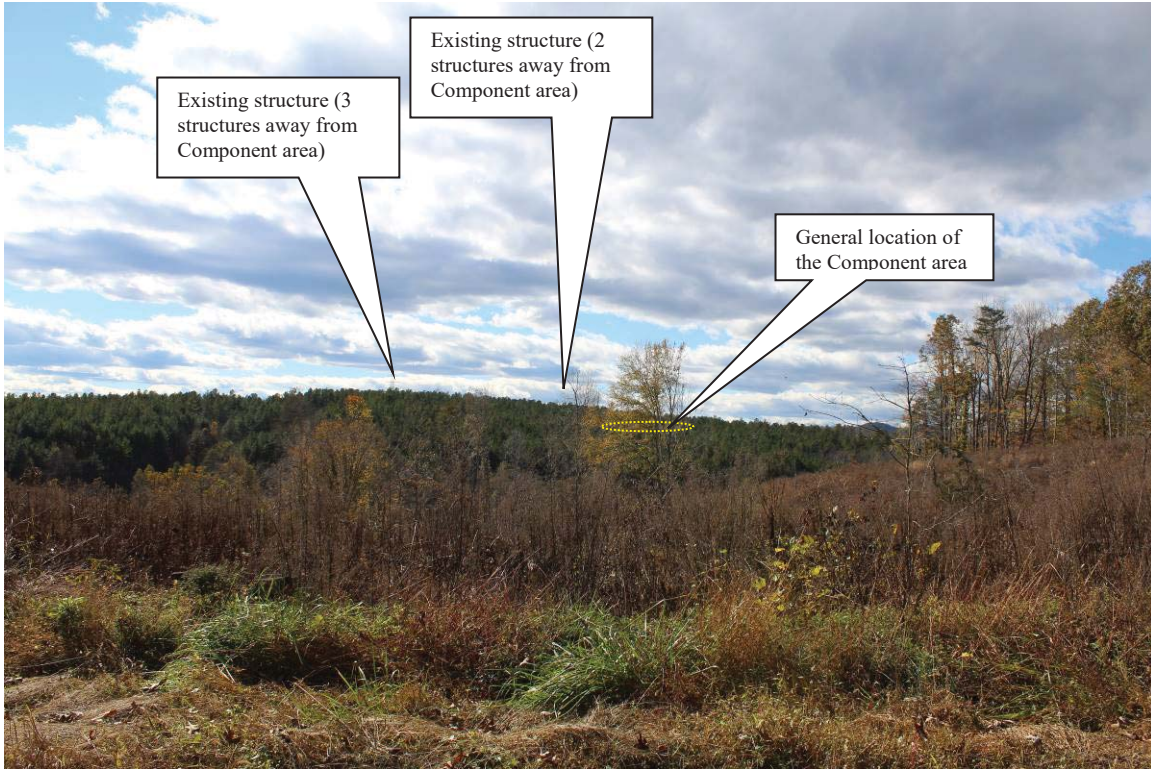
View from Old Green Mountain Road towards the Component area (not visible) showing existing transmission line structures
